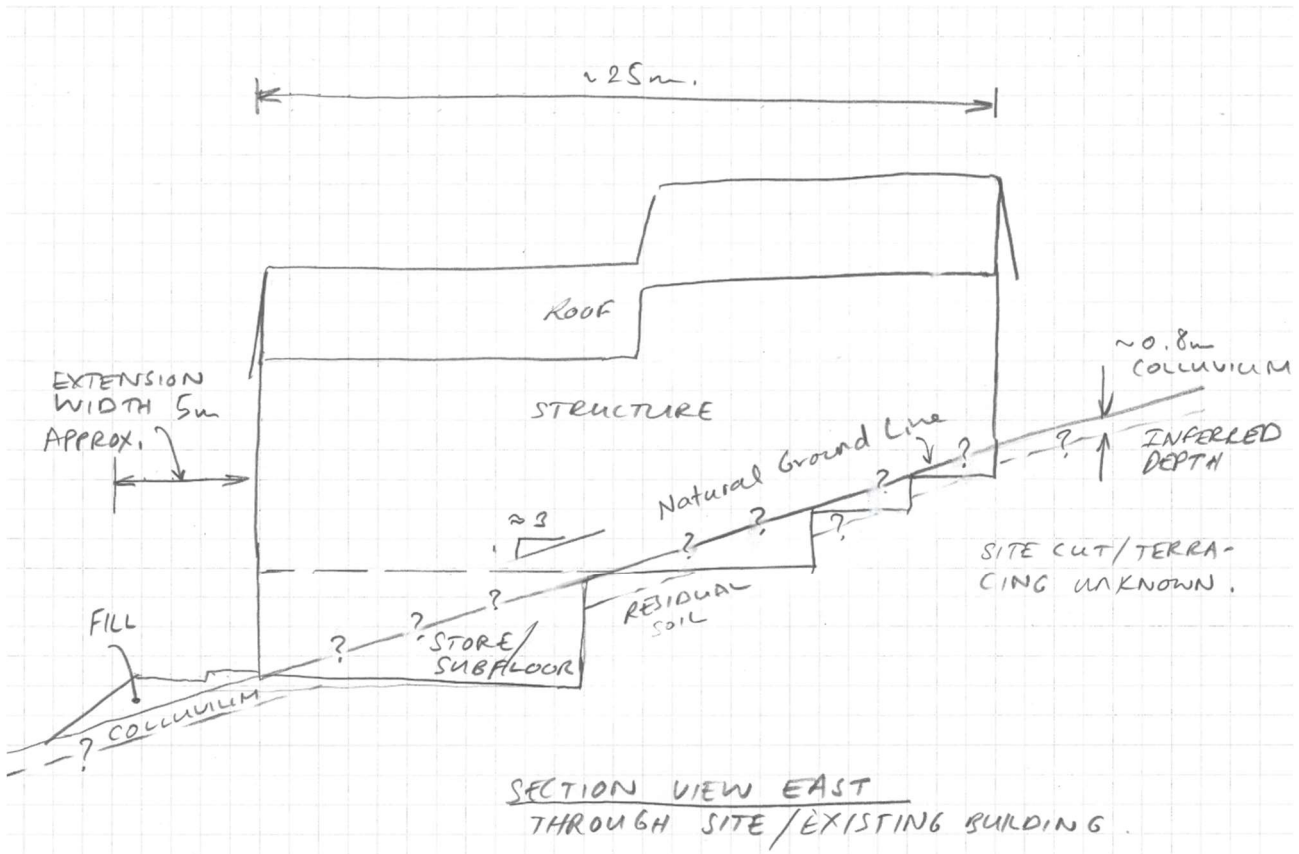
Section view field sketch of the full site. Note the extent of the extension area at the north of the structure. Surface boulders and cobbles are not shown.
